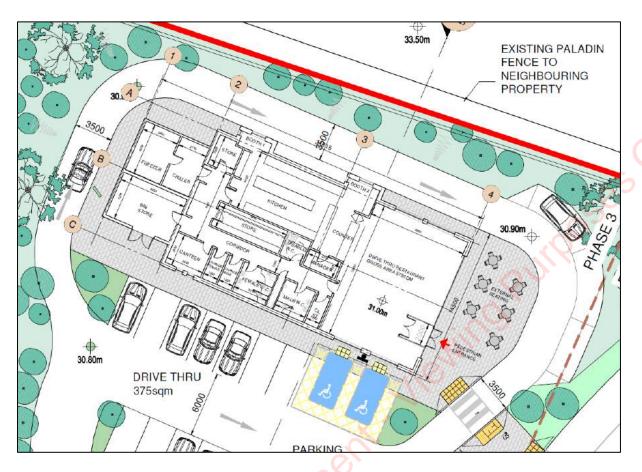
Extract from the ground floor plan showing the proposed Drive-Thru unit (Phase 3).
